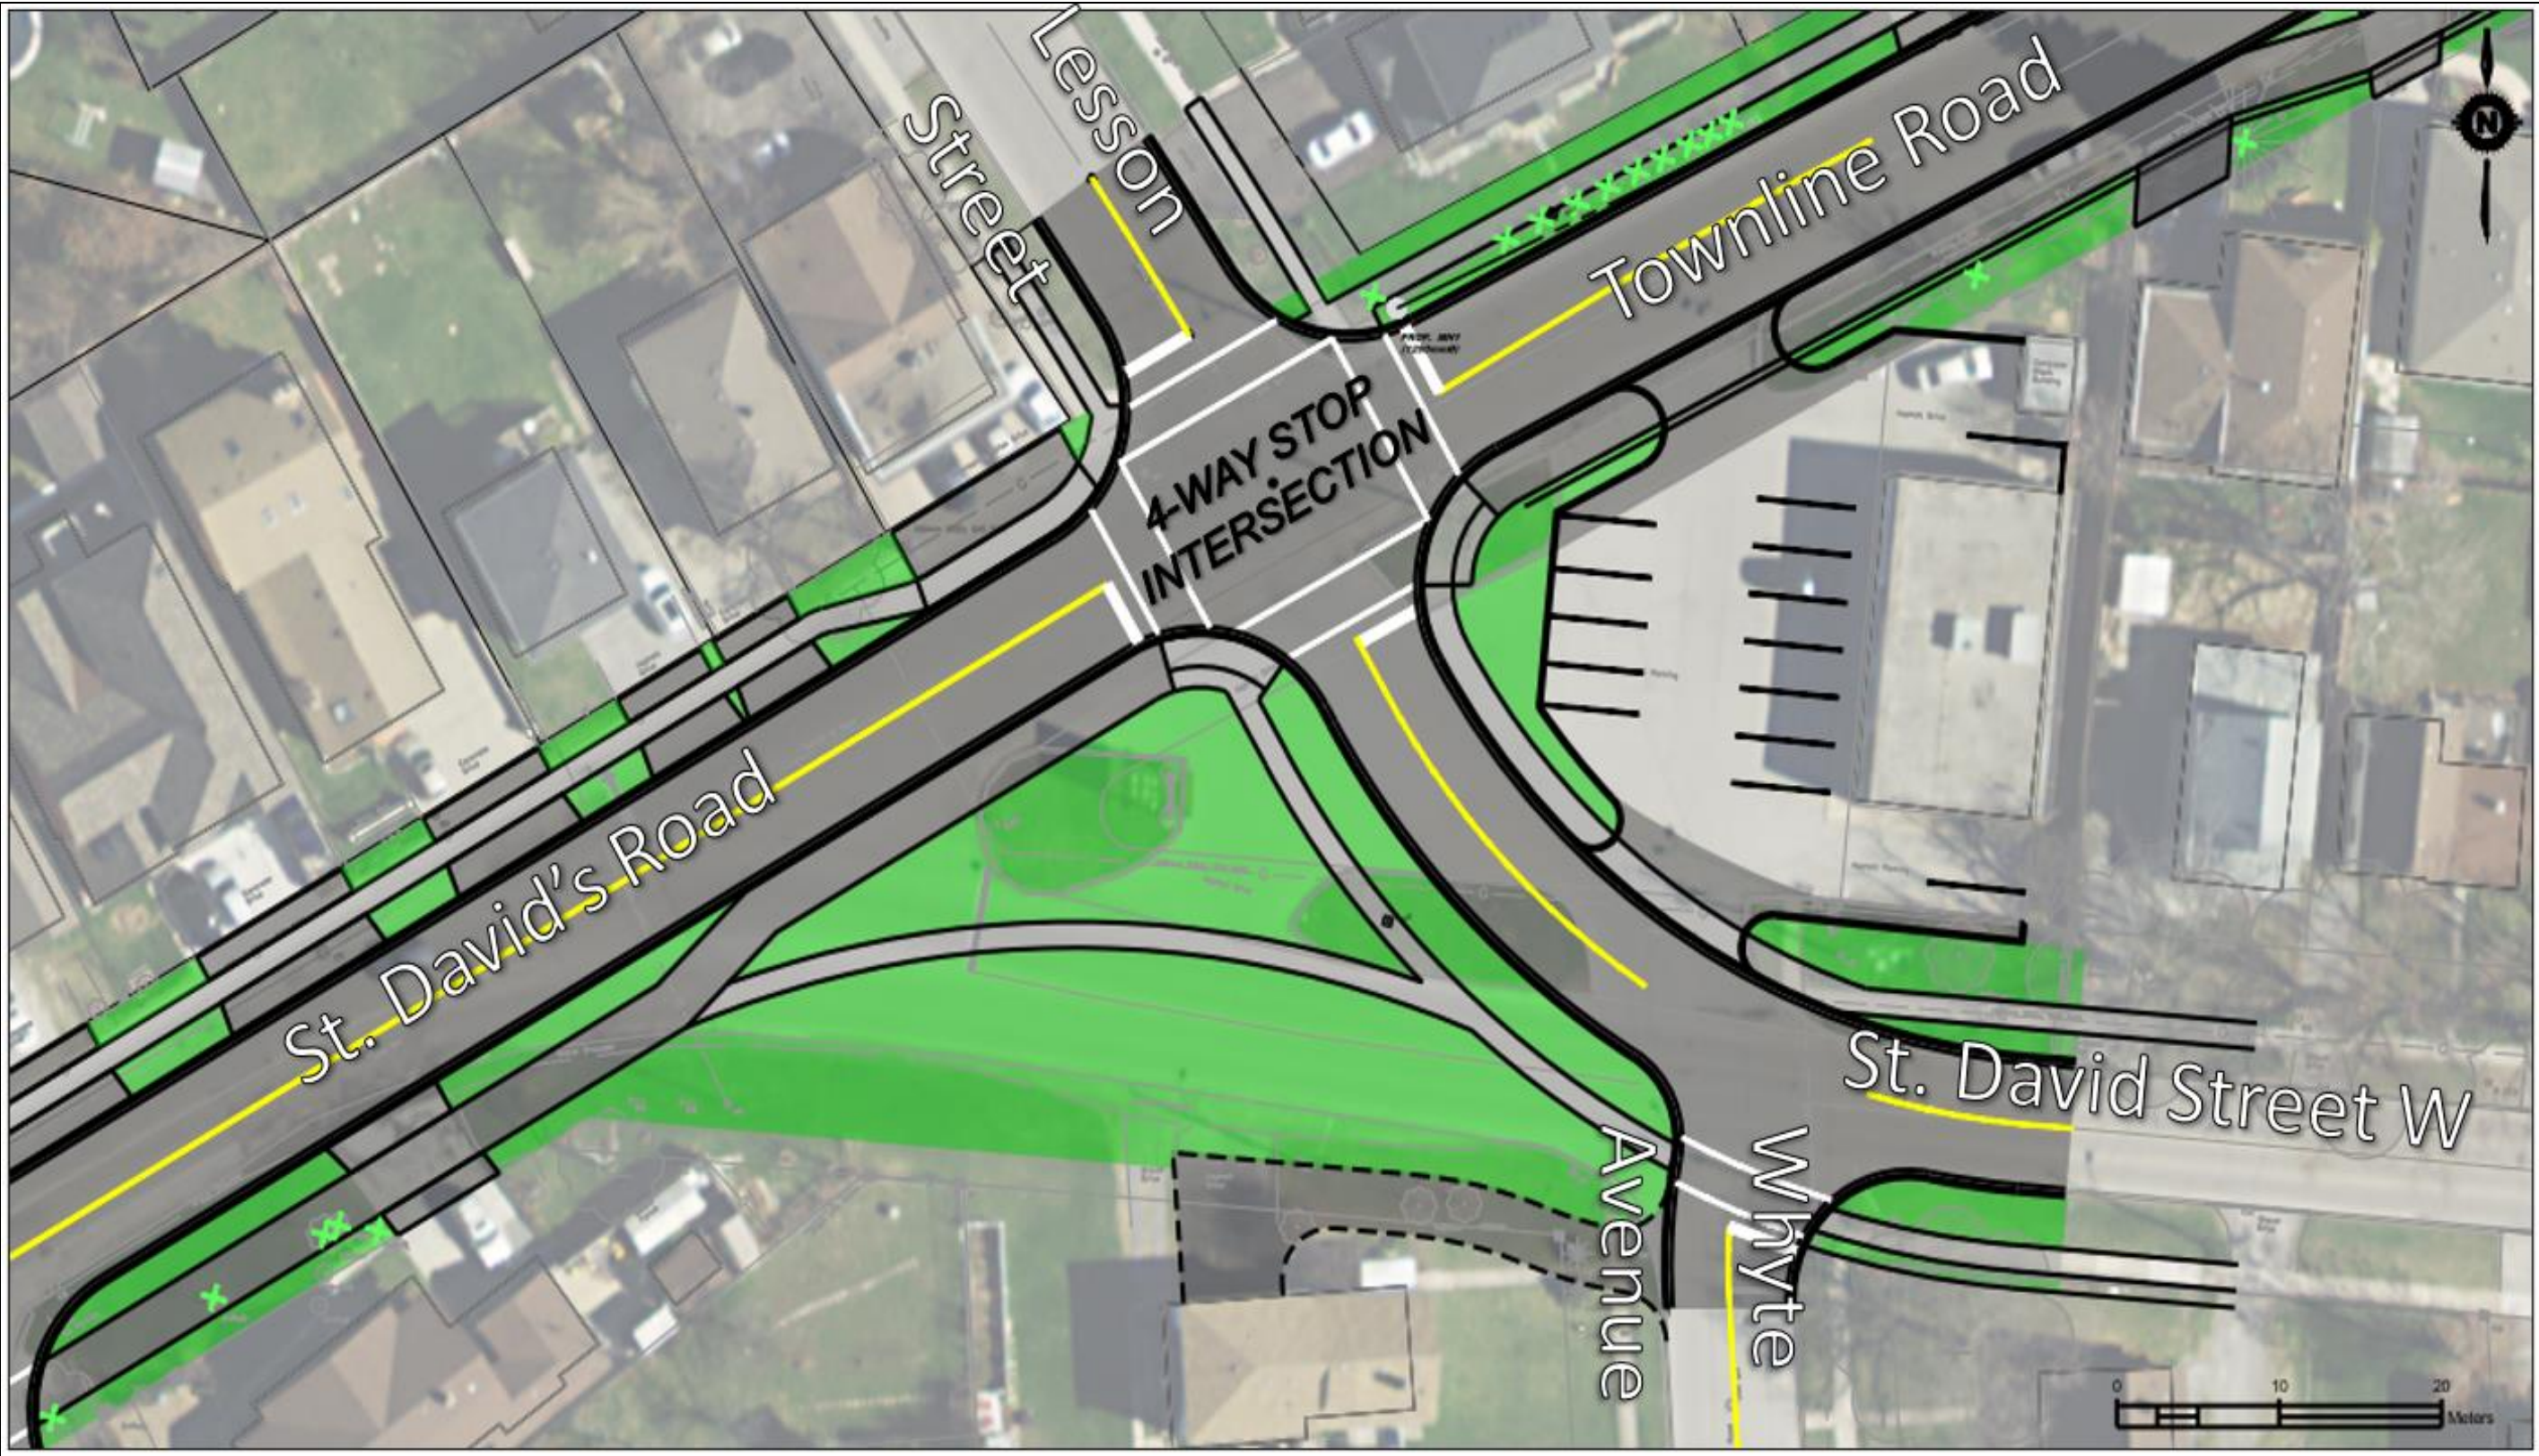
St. David's Road & Townline Road West Intersection Preferred Solution
